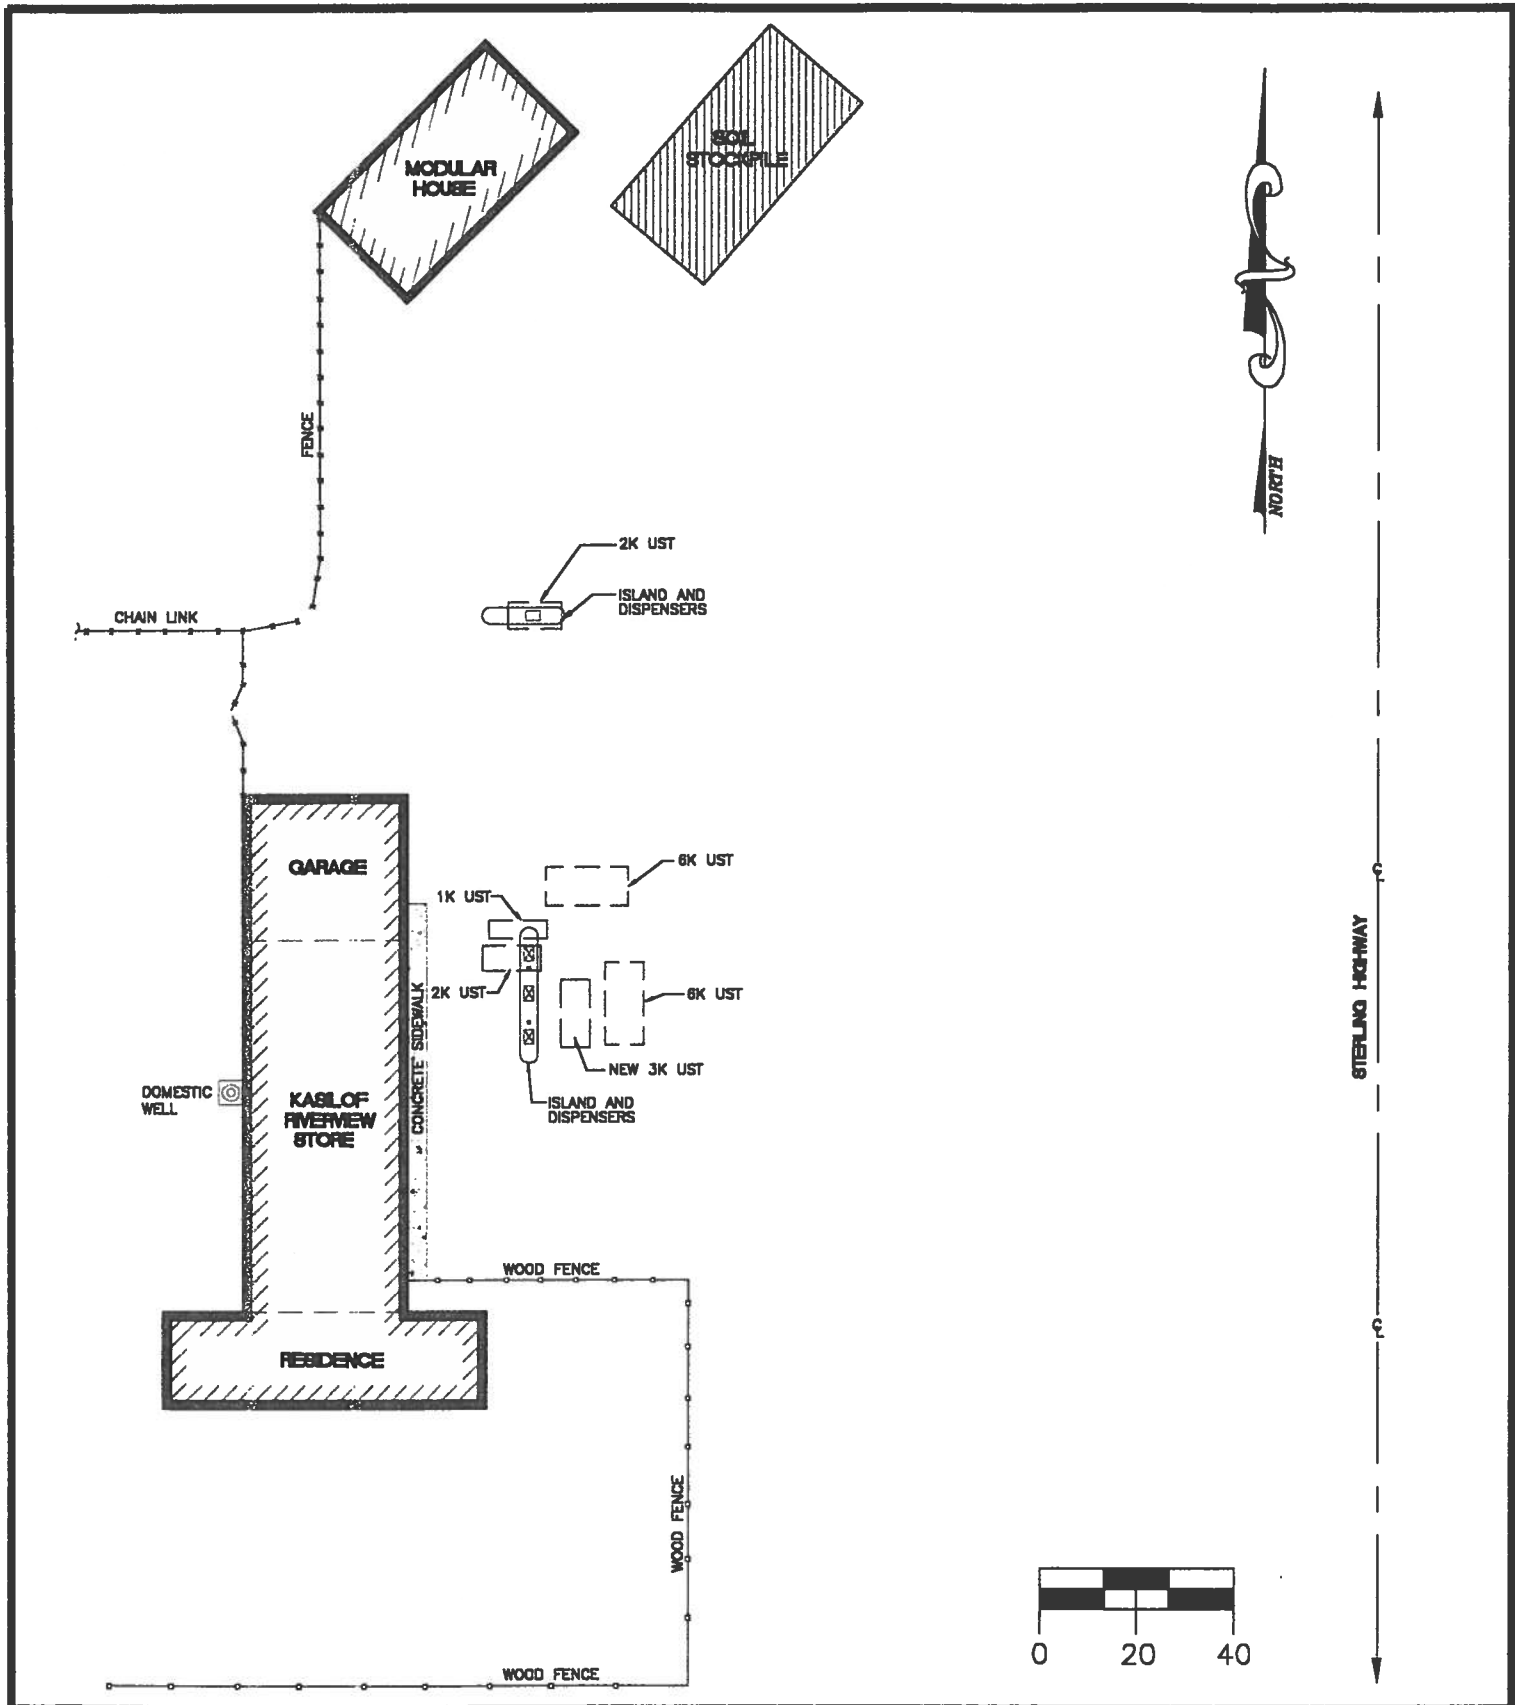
FIGURE II: KASILOF RIVERVIEW – SITE PLAN
